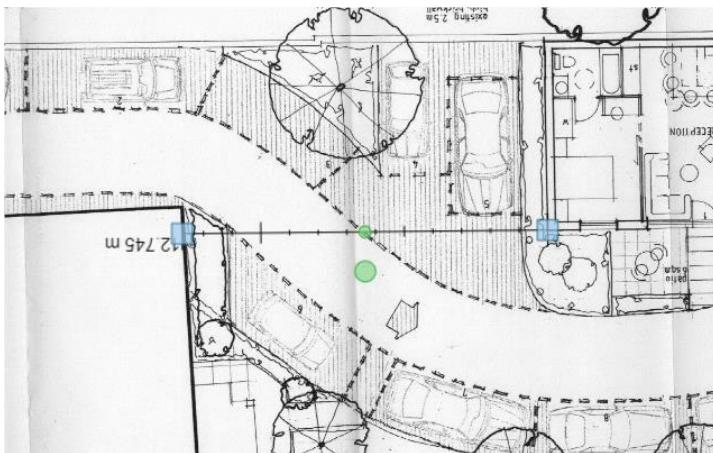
Proposed layout under refusal 11/3709/FUL (whilst at 12.75m, the flank wall does not extend in front of the affected windows)
